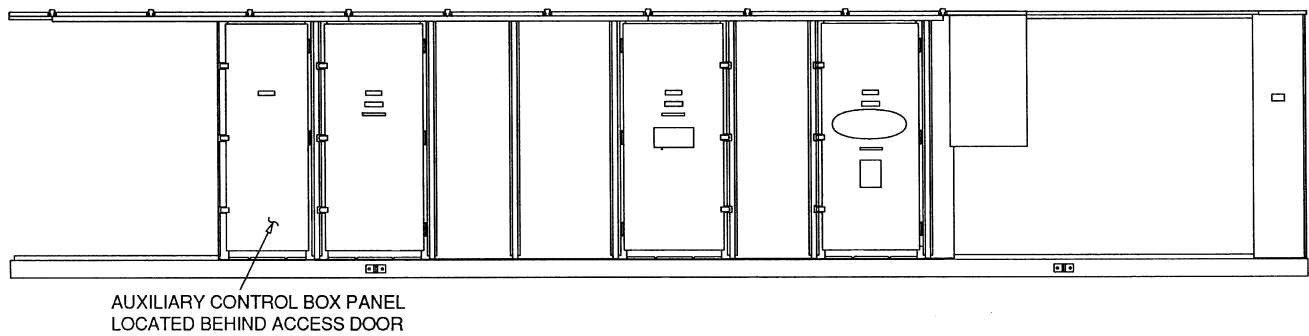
Auxiliary Control Box Location; Size 054-074 Units
